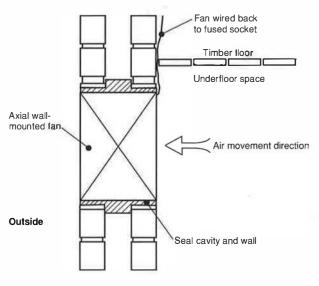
Mechanical extract ventilation with a wall-mounted axial fan
